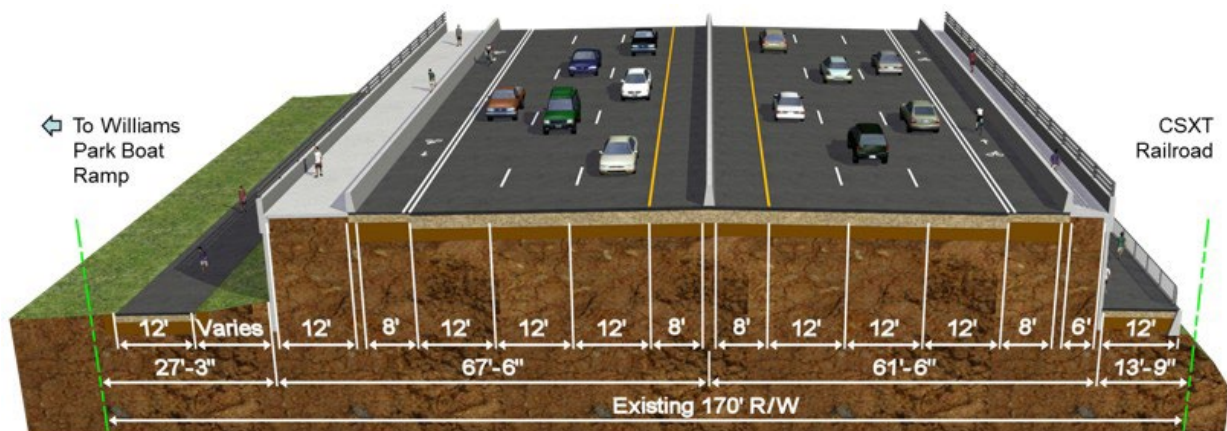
| Proposed US 41 Roadway Typical Section - North of Alafia River to South of Riverview Drive
